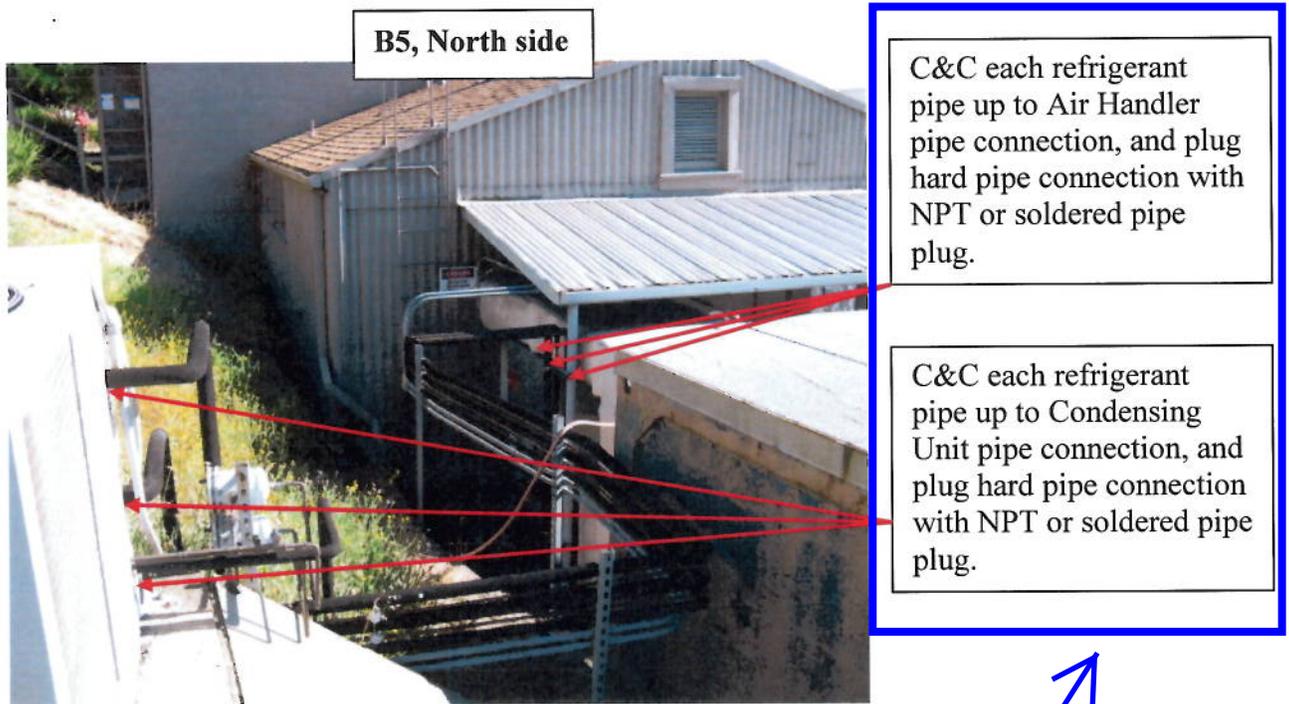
Condensing Unit refrigerant piping to B5 Air Handler
